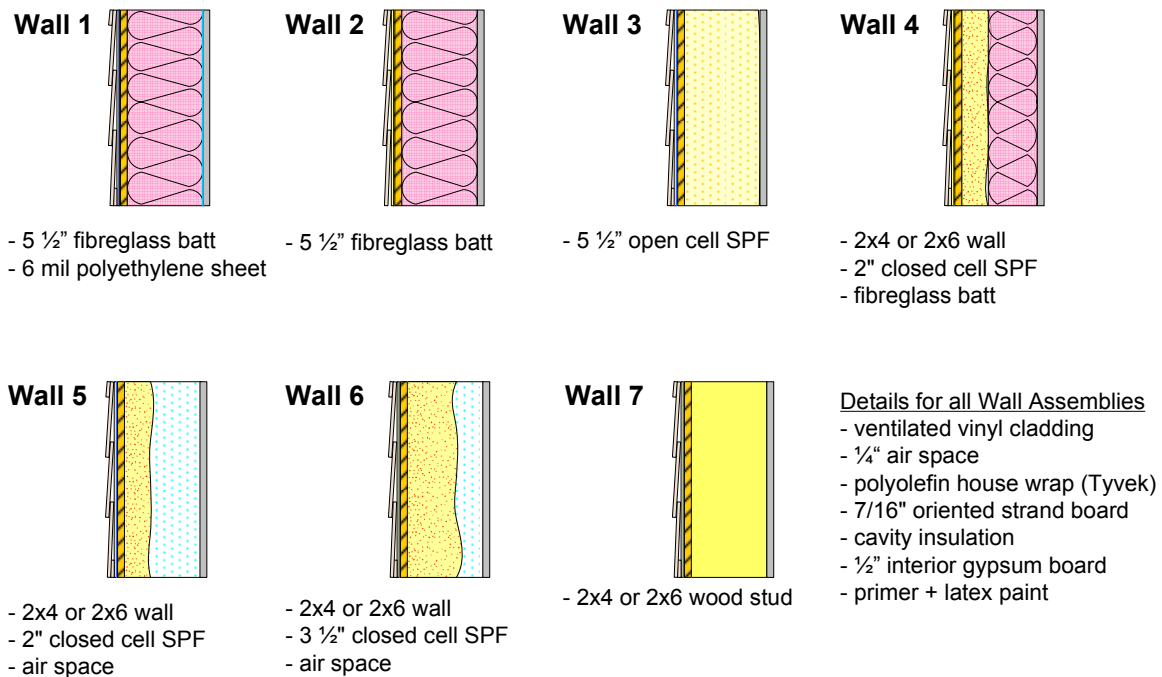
Cross-sections of Modelled Wall Assemblies
